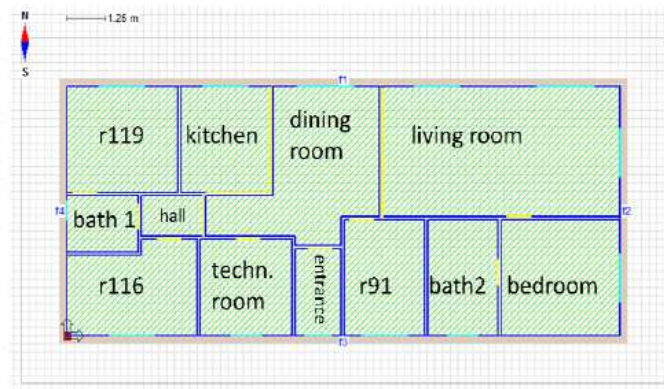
Ground plan of 159m² single-family house built in IDA-ICE
